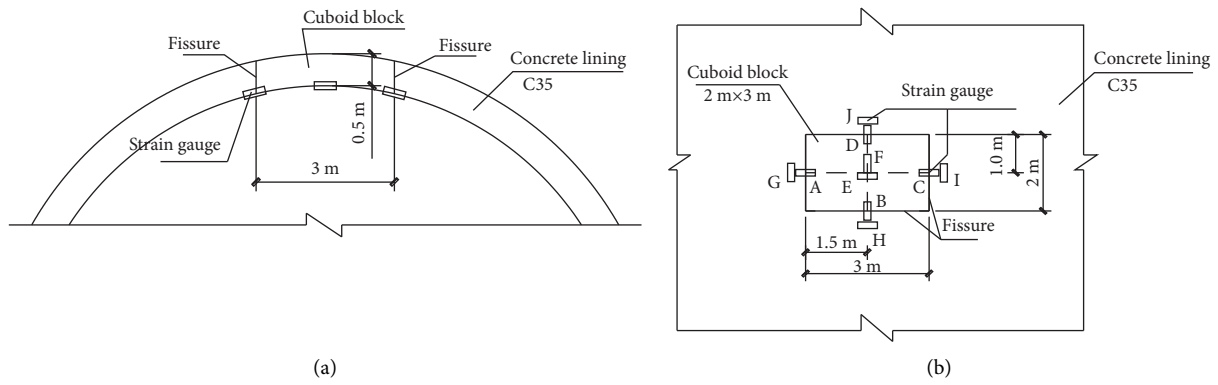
Strain measurement points on the spray film material for the rectangular test block. (a) Front view. (b) Top view.
